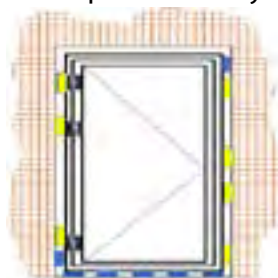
Shimming of entrance door (Technical Manual of Windows Installation, POVAS 2019)
